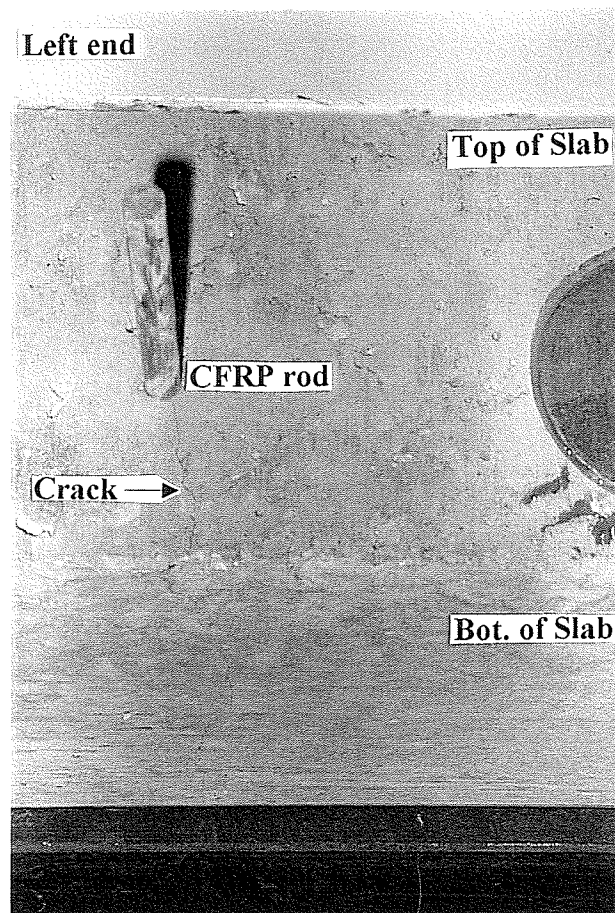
Bond cracks at left end of slab LL-200-C after failure.
